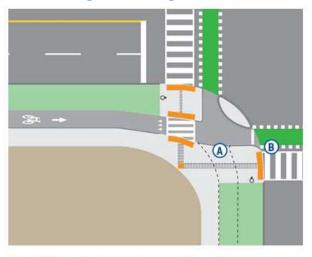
Standard protected corner with transition to major road without cycling facilities
